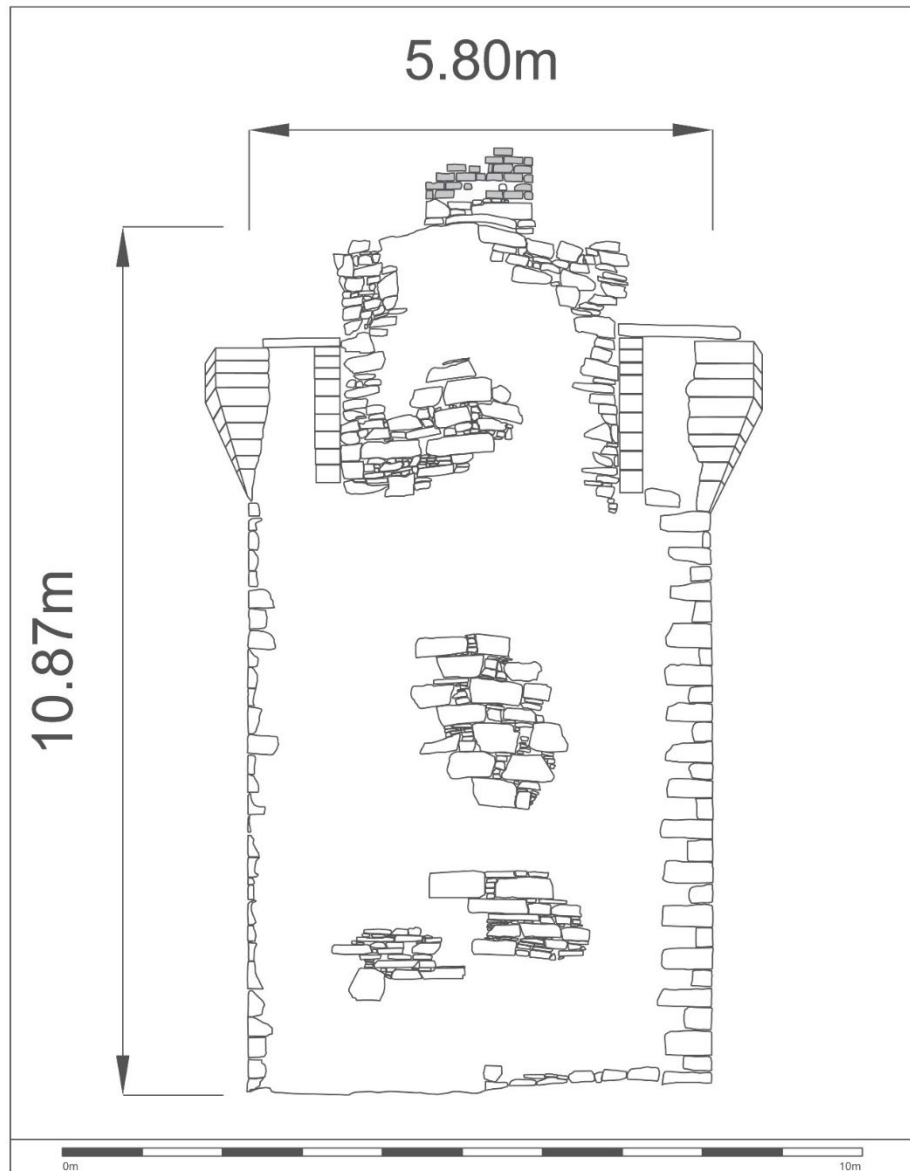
External elevation of the south-east wall of the signal tower at Crohy Head Signal Station.
